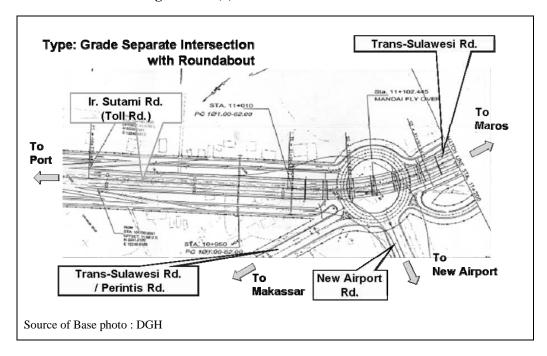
(2) Intersection Plan for TS-6 IC
